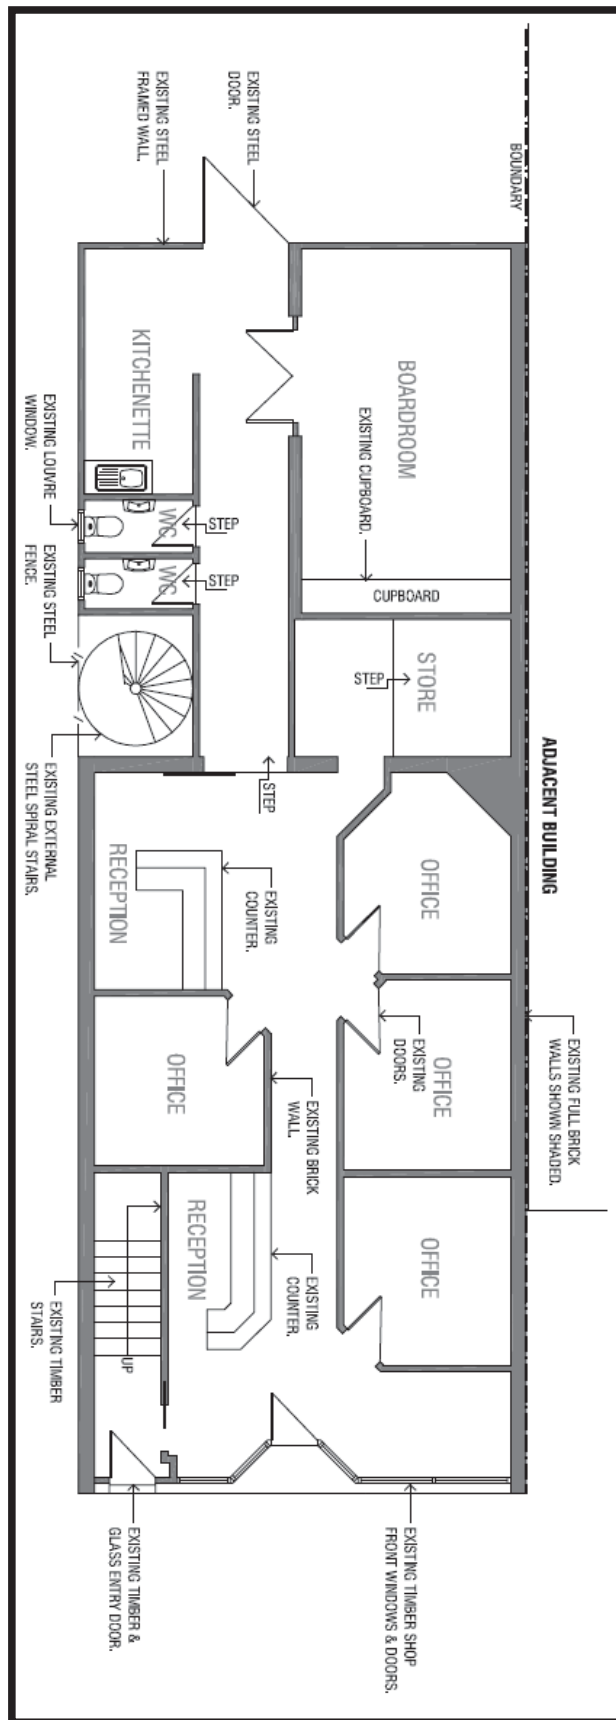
Existing ground floor layout (Source: Icono Building Design)
